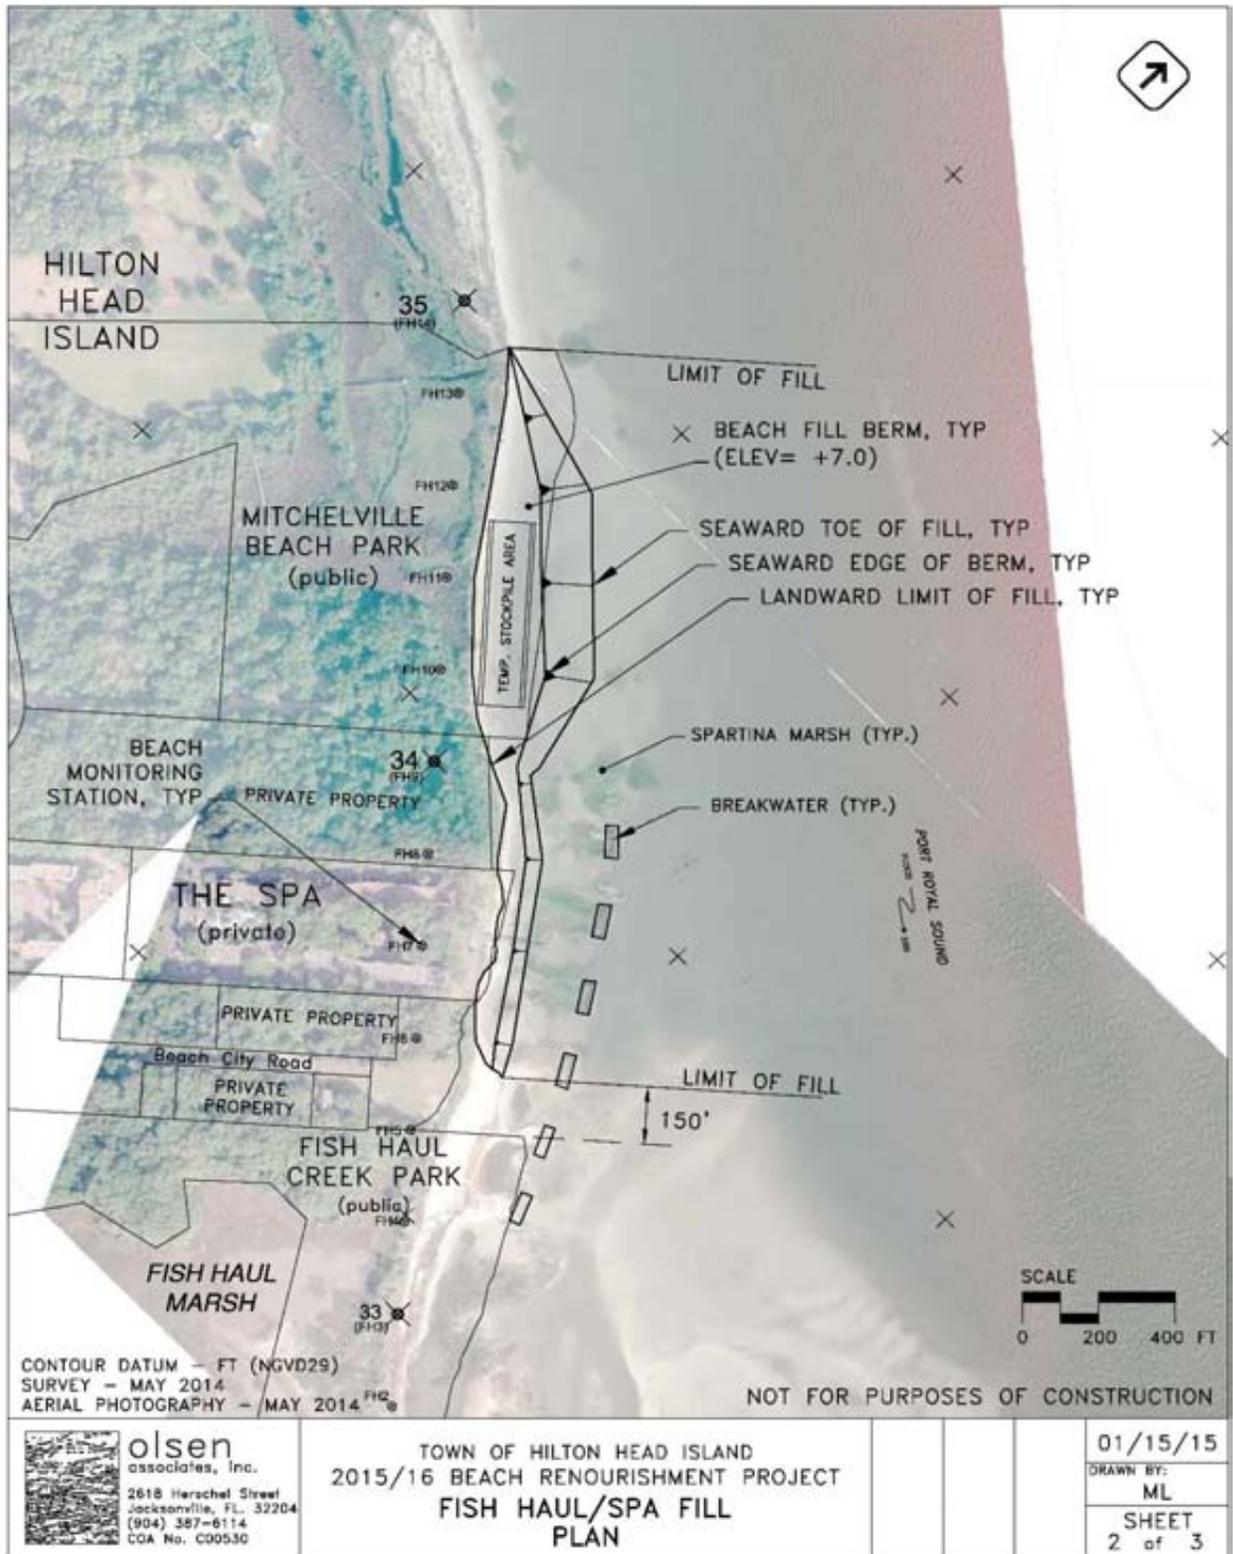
2016 Fish Haul/Spa Beach Renourishment Project Fill Plan
